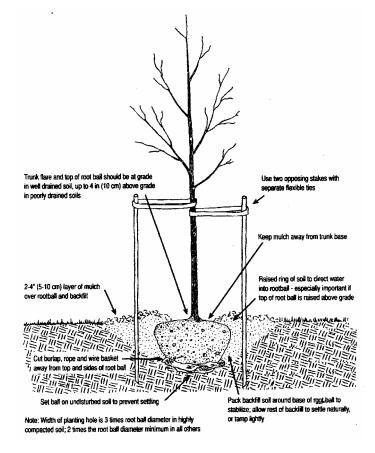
Tree Planting Detail. Source: University of Connecticut Extension Service.
